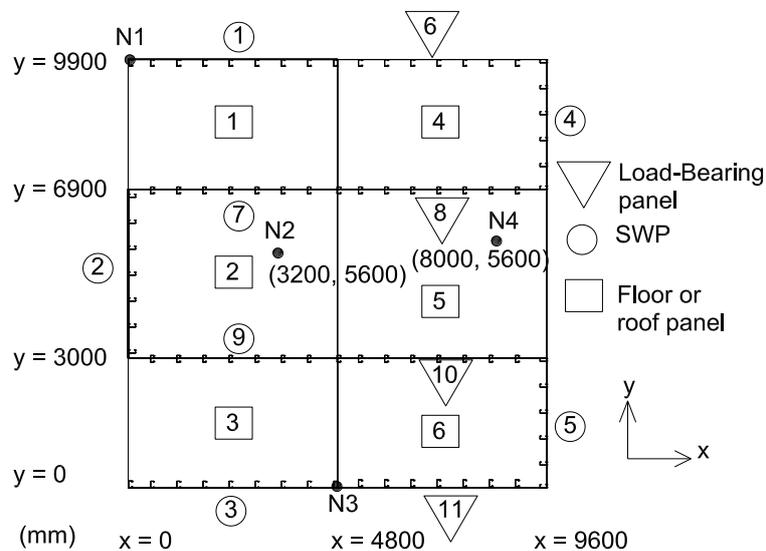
Typical floor plan and element illustration of the three-storey CFS building
